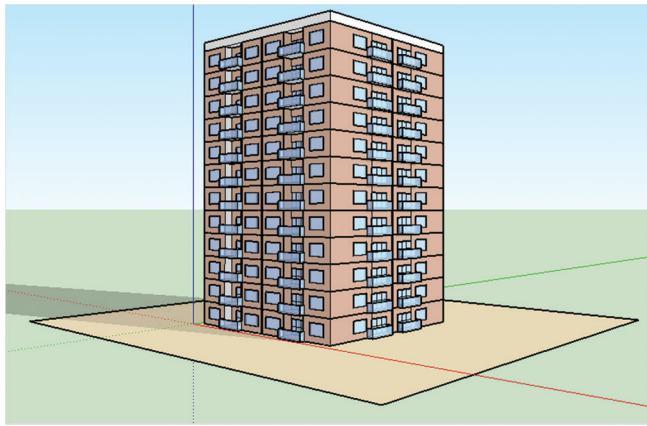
Case study building model constructed in SketchUp (Source: Author).
